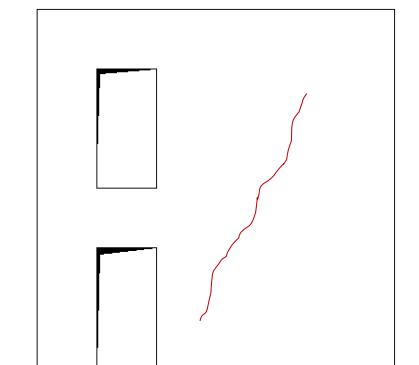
Failure mode of a masonry wall with generic pseudo-diagonal cracks.
